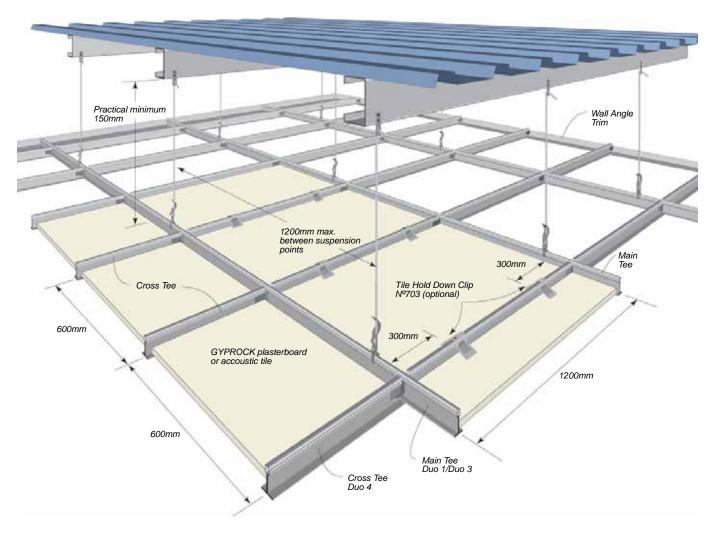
TYPICAL INSTALLATION DETAIL - FRICKER EASY ACCESS SYSTEM® WITH ACOUSTIC CEILING TILES
